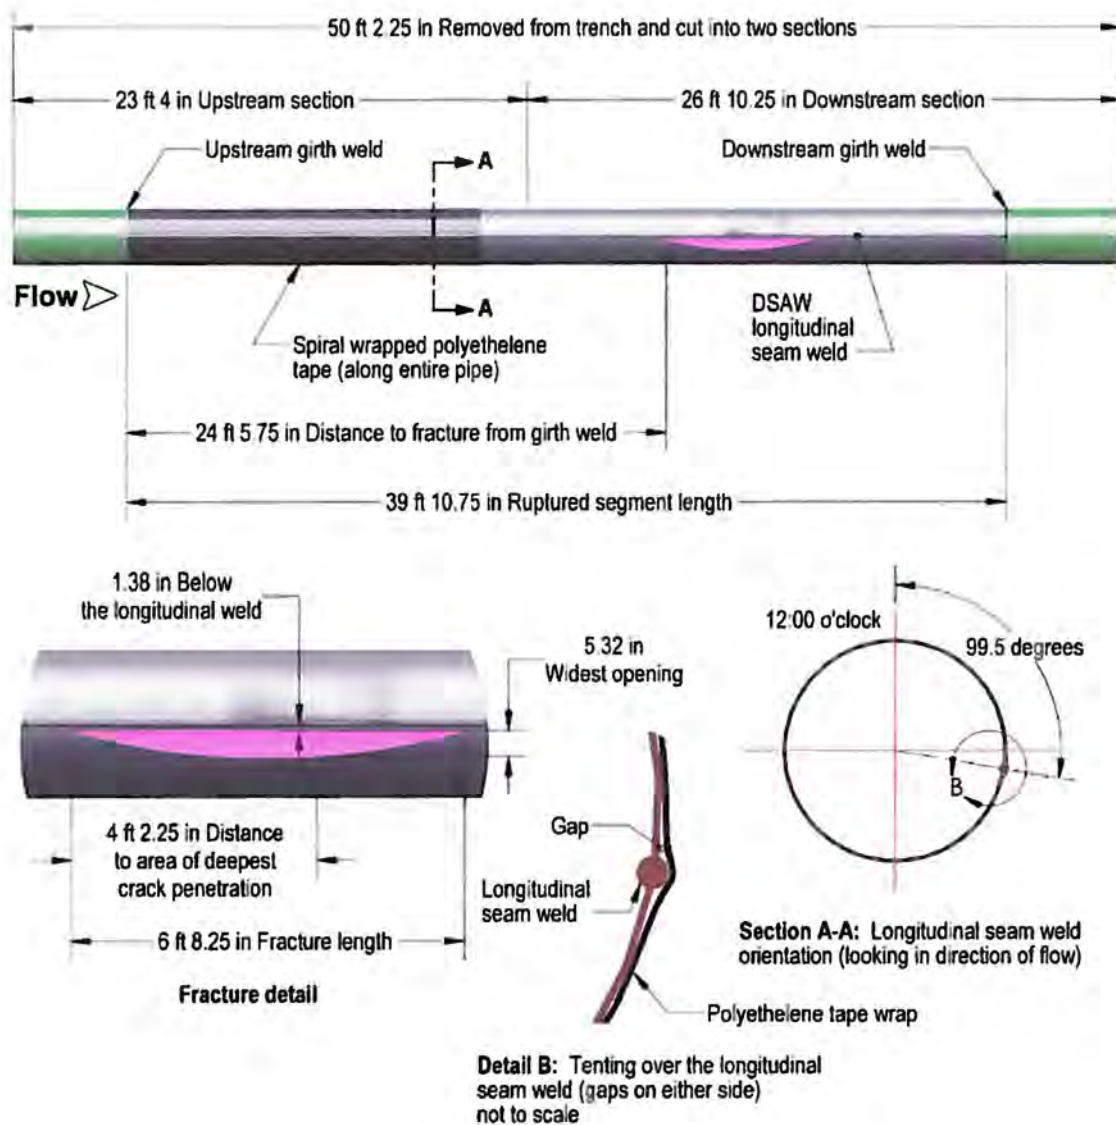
Line 6B ruptured segment showing upstream and downstream sections used for Materials Laboratory examination. Detail B shows tented coating over the longitudinal seam weld.
